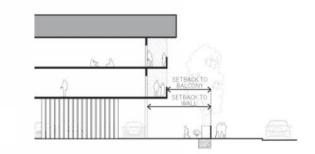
front boundary setback to balcony and wall
